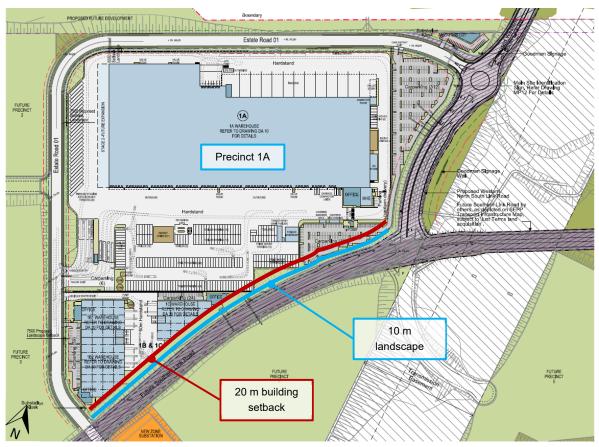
| Approved Stage 1 Layout under SSD 7348 MOD 2
